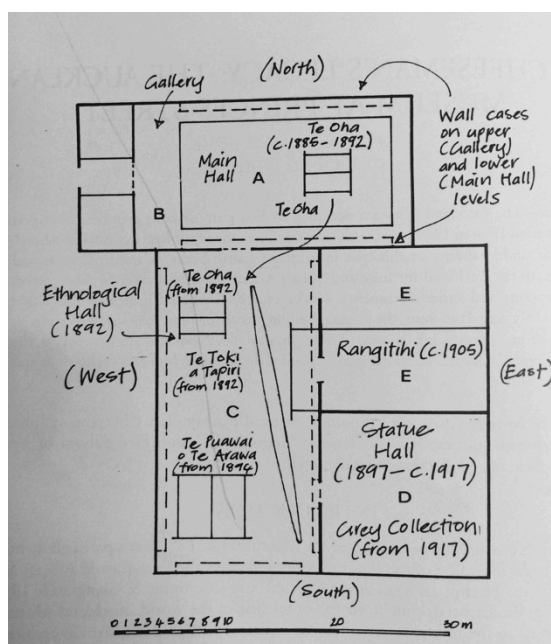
Floor plan, AM Princes Street after full extension. Wolfe, 2001 p2
